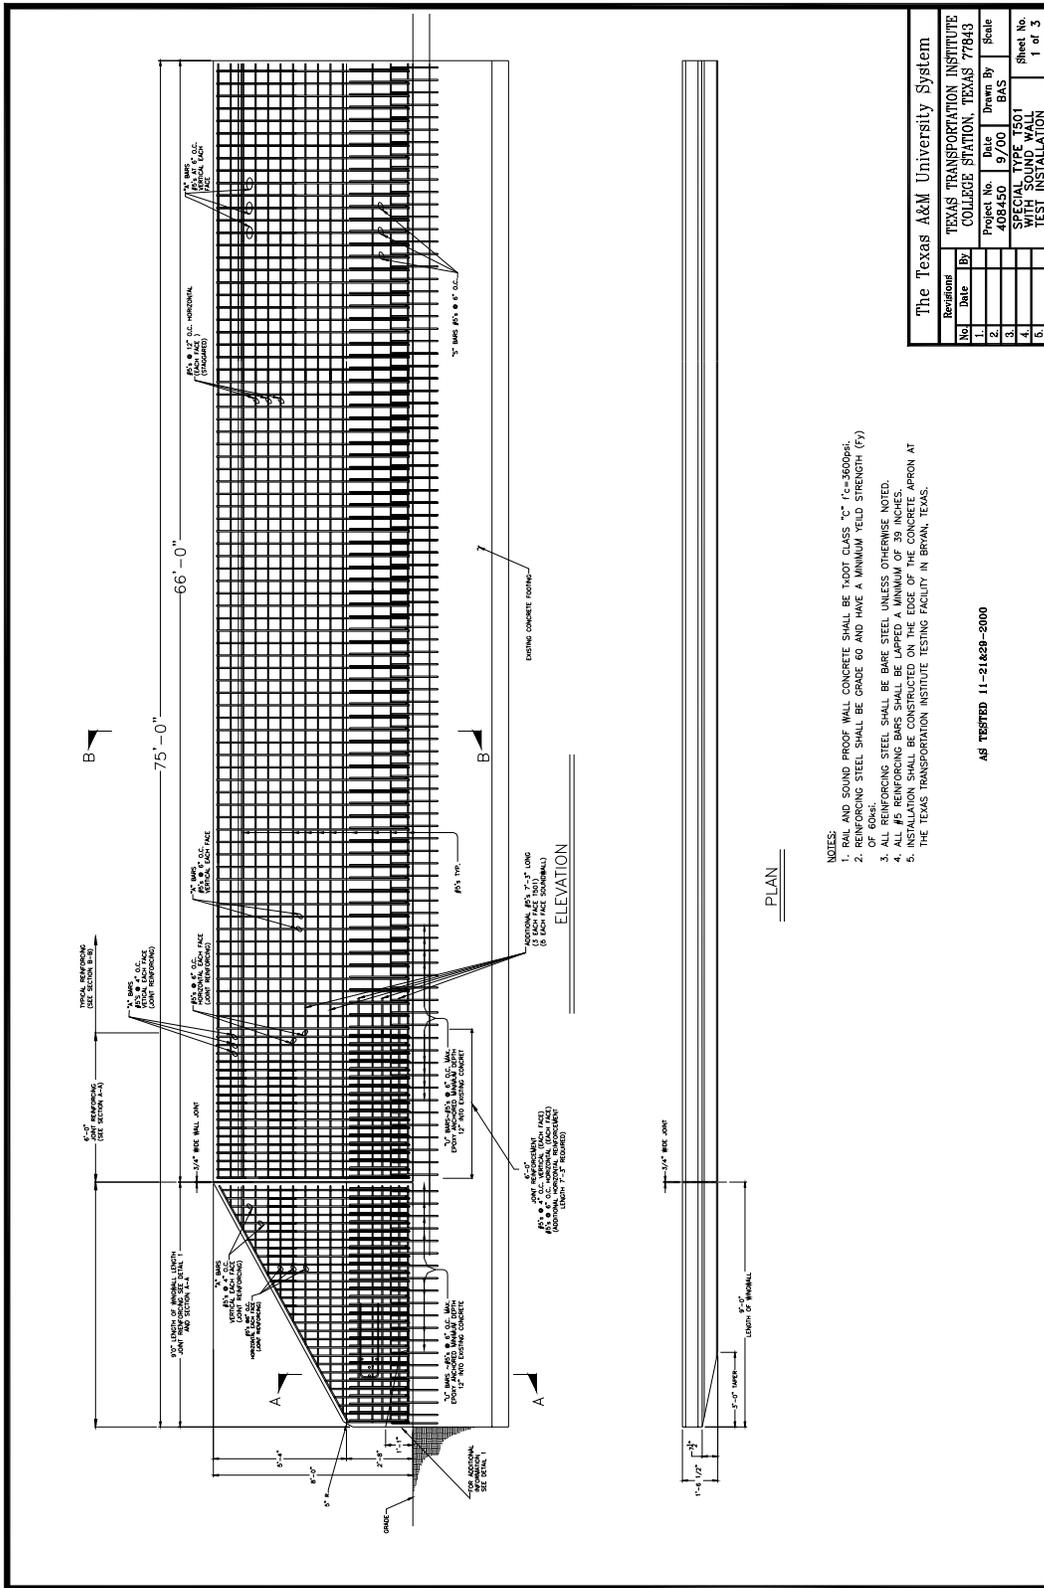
Details of the T501 Bridge Rail with Soundwall.
